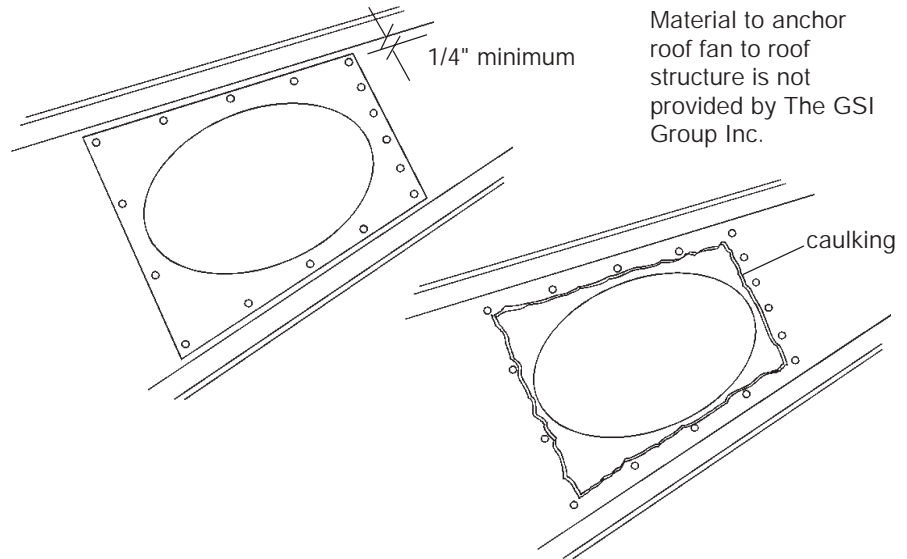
The 18" template location on the roof sheet (left), and the caulking location on the roof sheet (right).
